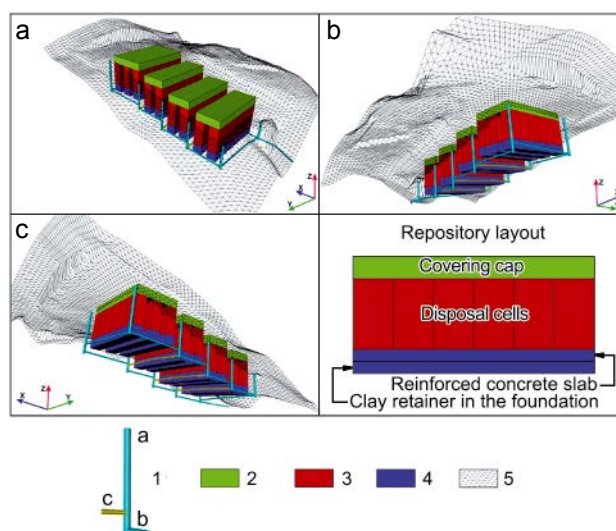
Example of a drainage system: 1 – double-circuit drainage: a well (a), drainage pipes of the external (b) and internal (c) circuits; 2–4 – repository: upper waterproofing cap (2), structure (3), reinforced concrete slab and clay retainer in the foundation (4); 5 – surface of the leveled landscape.
